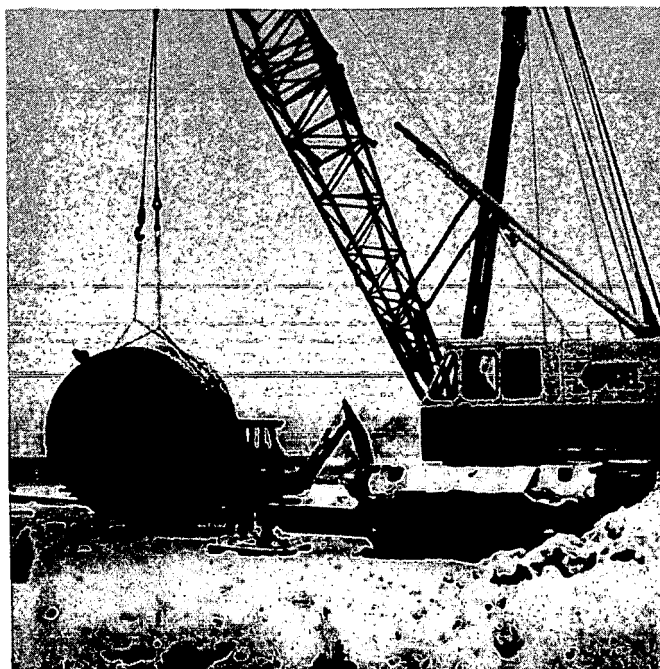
EXCAVATED EAST HOLDING TANK
